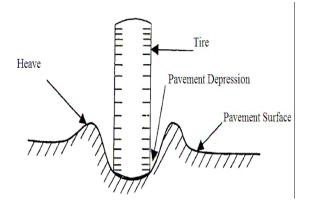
Pavement surface deformation, (Archilla 2000)
